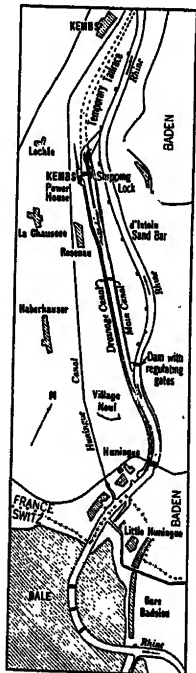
KEMBS POWER PLANT. LOCATION PLAN
